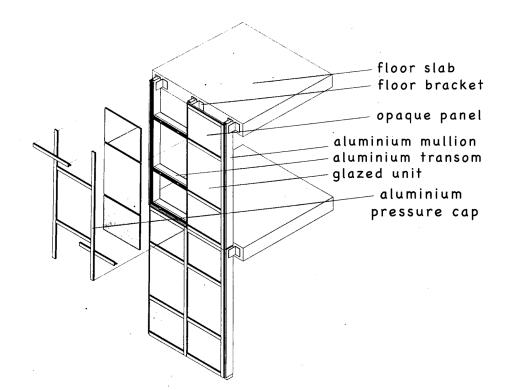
Schematic of stick-system curtain walls (Source: Roberts & Guariento, 2009)
